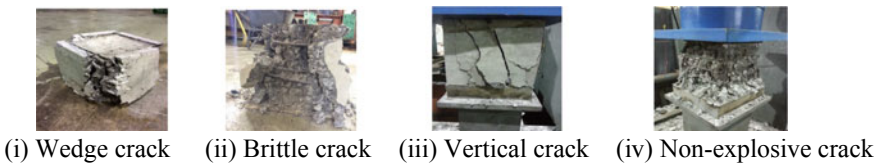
Modes of failures for reinforced concrete blocks concentrically loaded through 150 mm × 150 mm square steel plates
